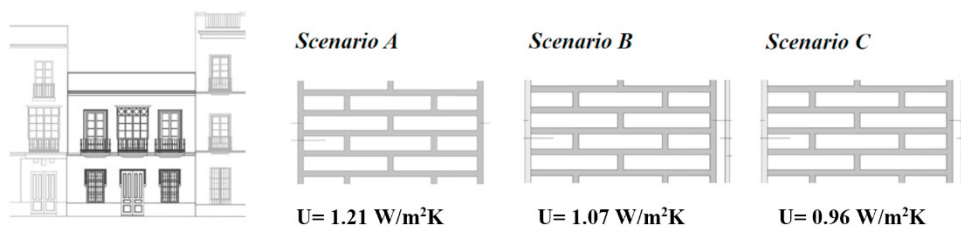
Thermal transmittance of the façade wall of a traditional Spanish case study building.
